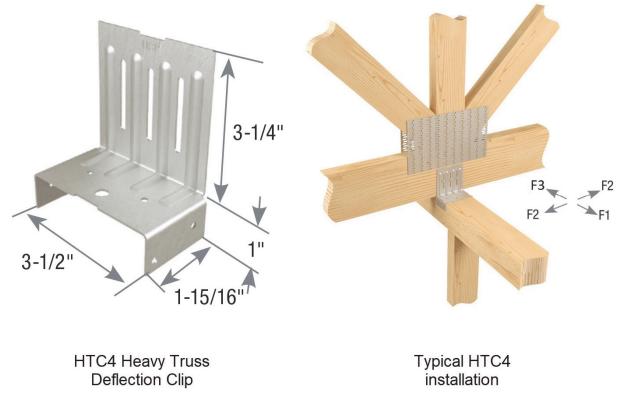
HTC HEAVY TRUSS DEFLECTION CLIP
